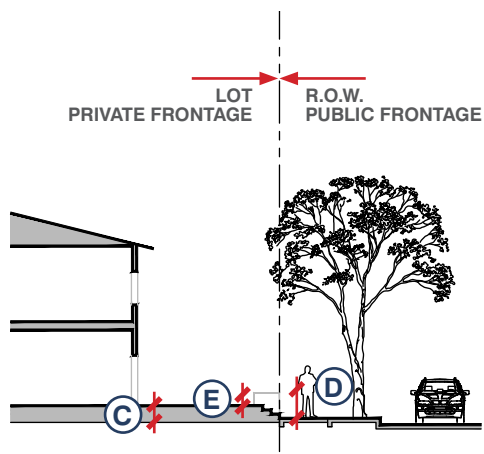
DOORYARD FRONTAGE SECTION
